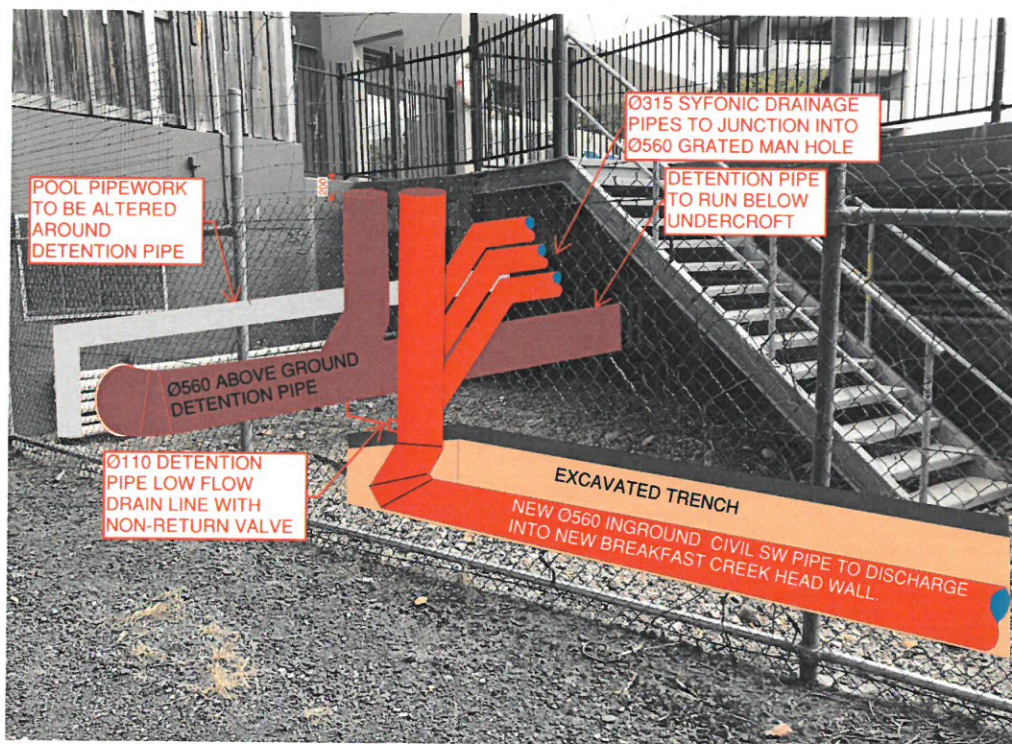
SITE DRAINAGE CONNECTION INTO NEW Ø560 CIVIL PIPE
